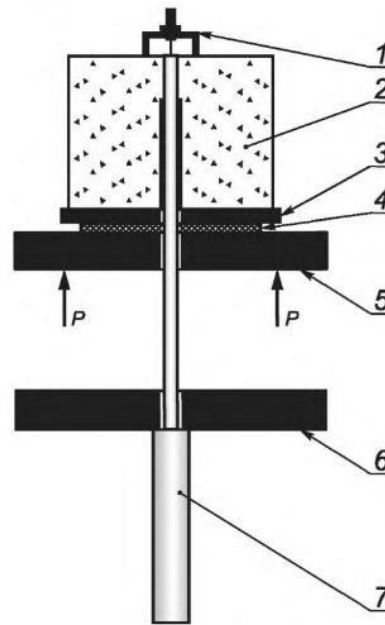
Test setup diagram for pulling GFRP rebar out of a concrete cube:
